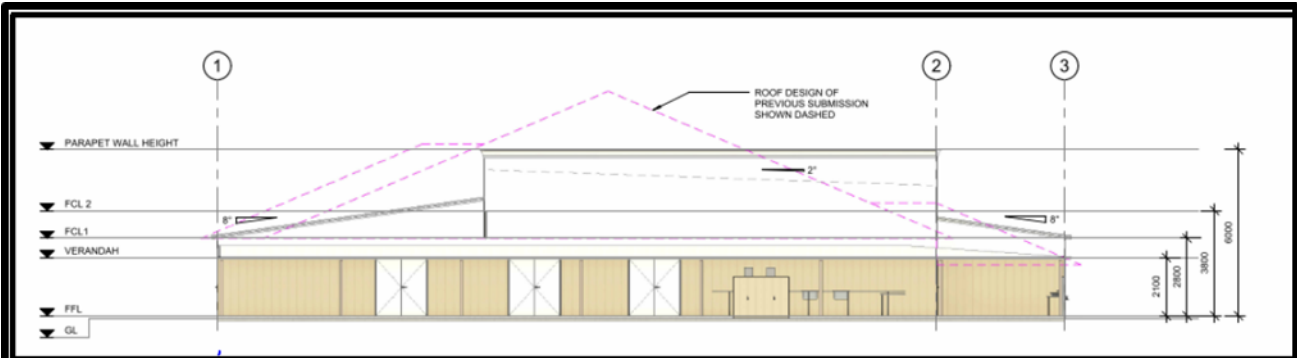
Front elevation of Lunch Hall with previous roof design shown dashed in pink
